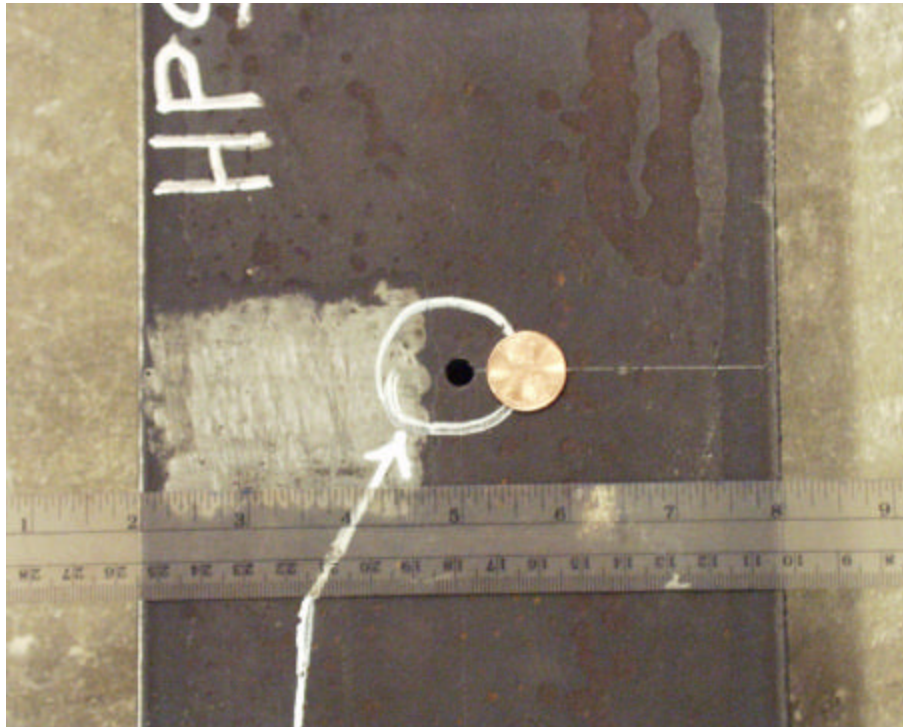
Fabricated Hole Size for HPS100W-1.0(a)
